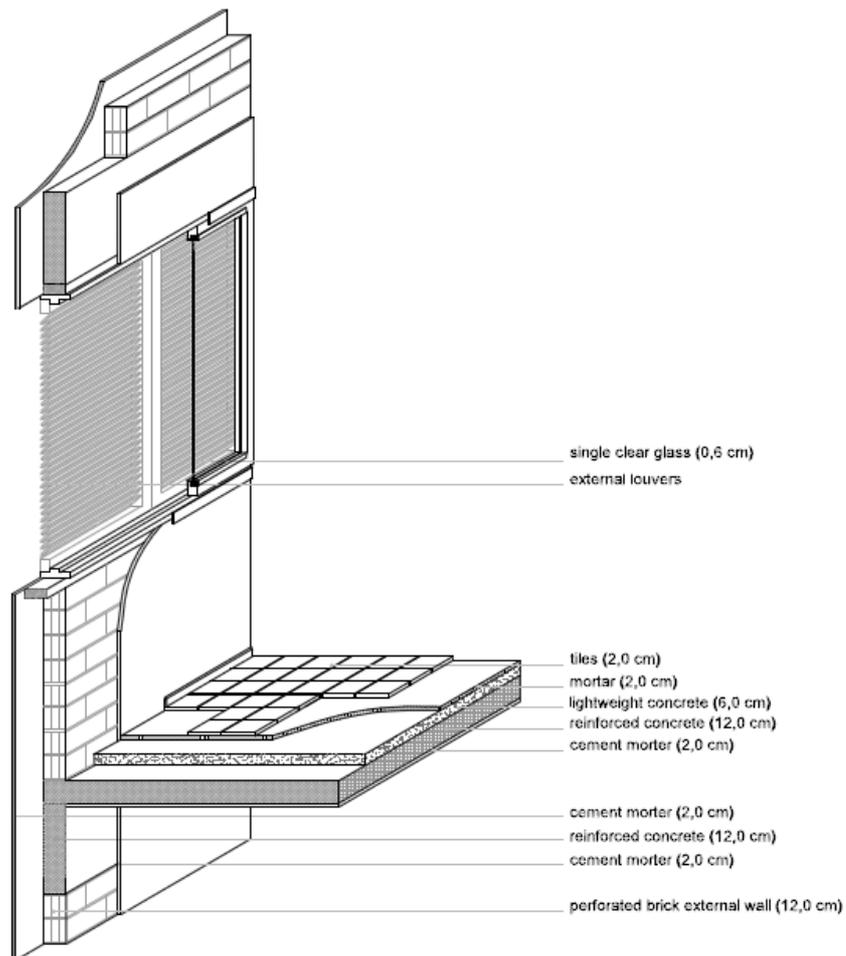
Detail 02 - wall, window and floor connection from inside
